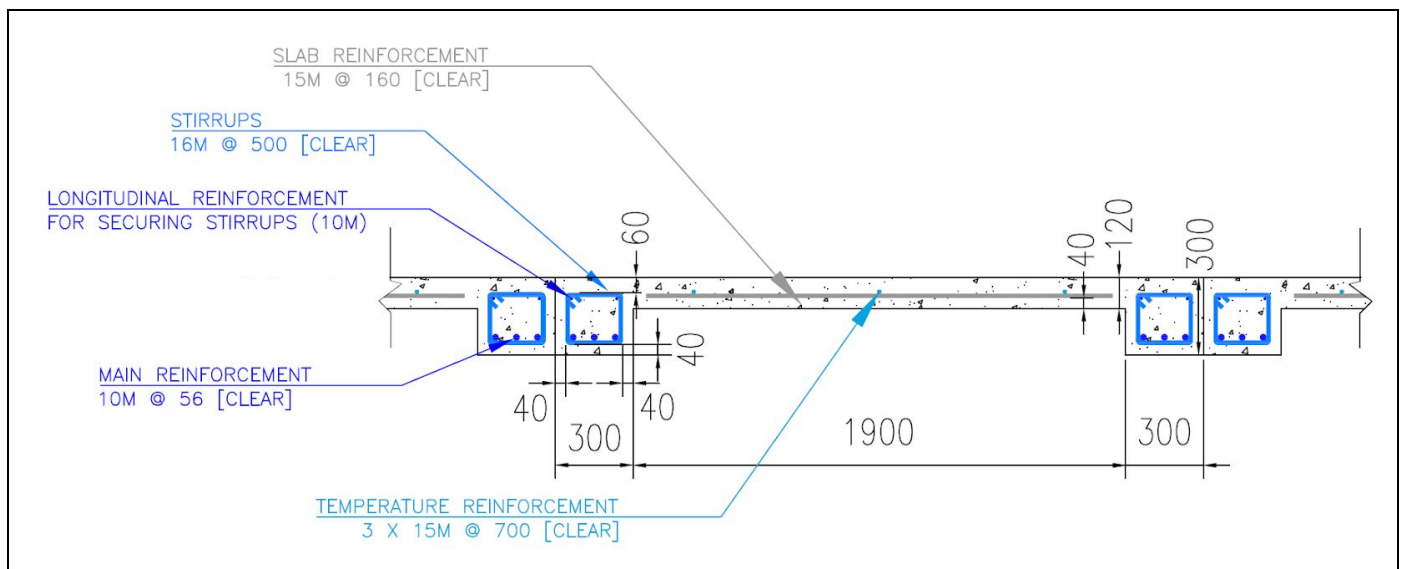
Underpass Detail - Top Slab Cross-Section (East-West)
